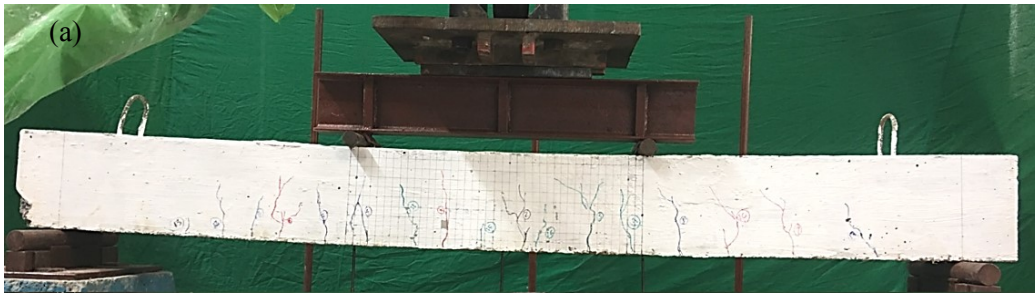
(a): Cracks in controlled beam, B1.
